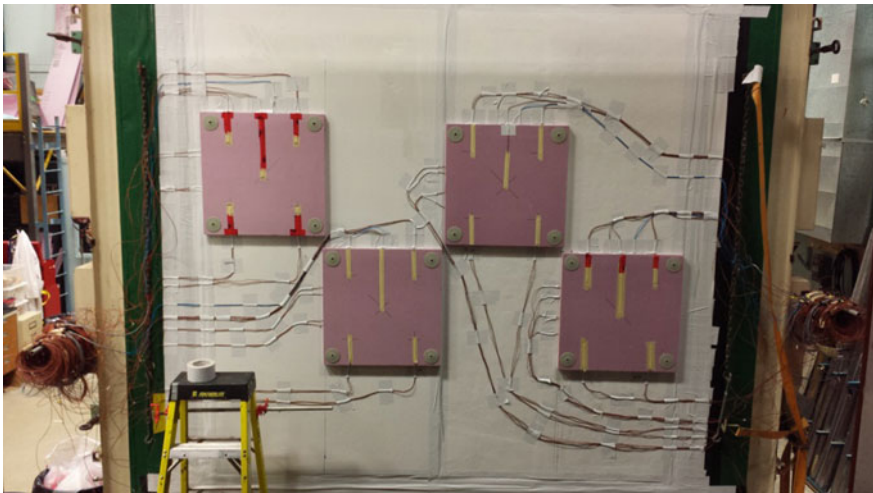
Four instrumentation modules mounted on the 6" wall sample
